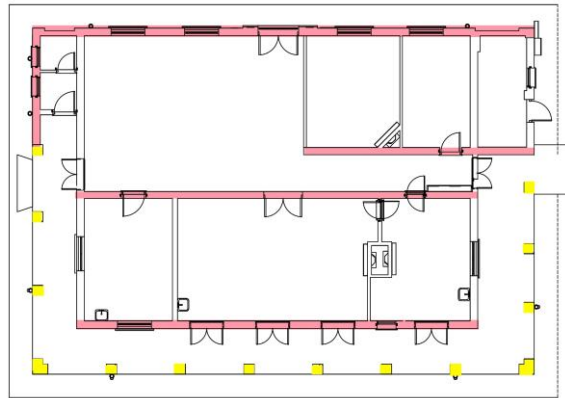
The plan shows the load bearing brick walls and concrete columns of the Main Block. The load bearing brick walls are highlighted in red. The concrete columns are highlighted in yellow. Edited by Hannah Liu.
